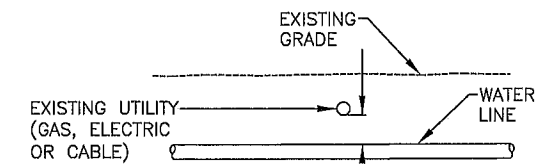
HORIZONTAL DIRECTIONAL DRILL UNDER CR E425N
